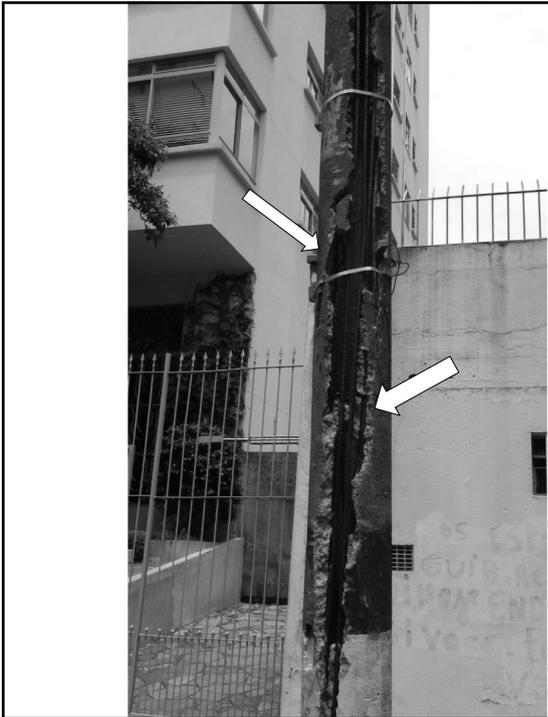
Typical cracking and spalling at parking garage columns
